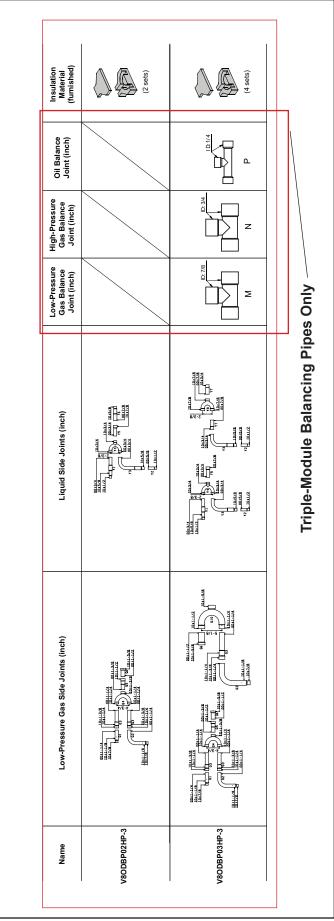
Connective Piping Sizes for Manifolded Outdoor Units
